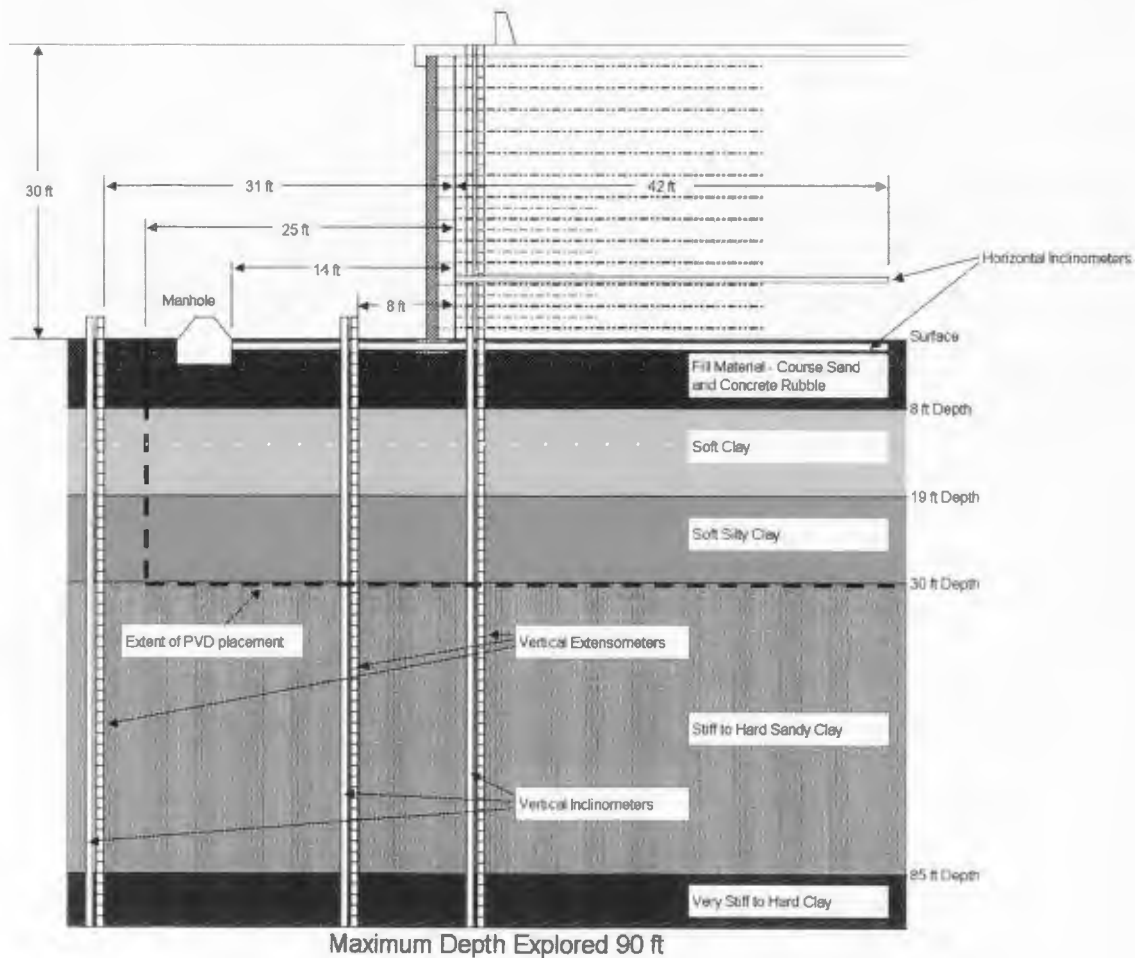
Elevation of wall and foundation showing foundation instrumentation
